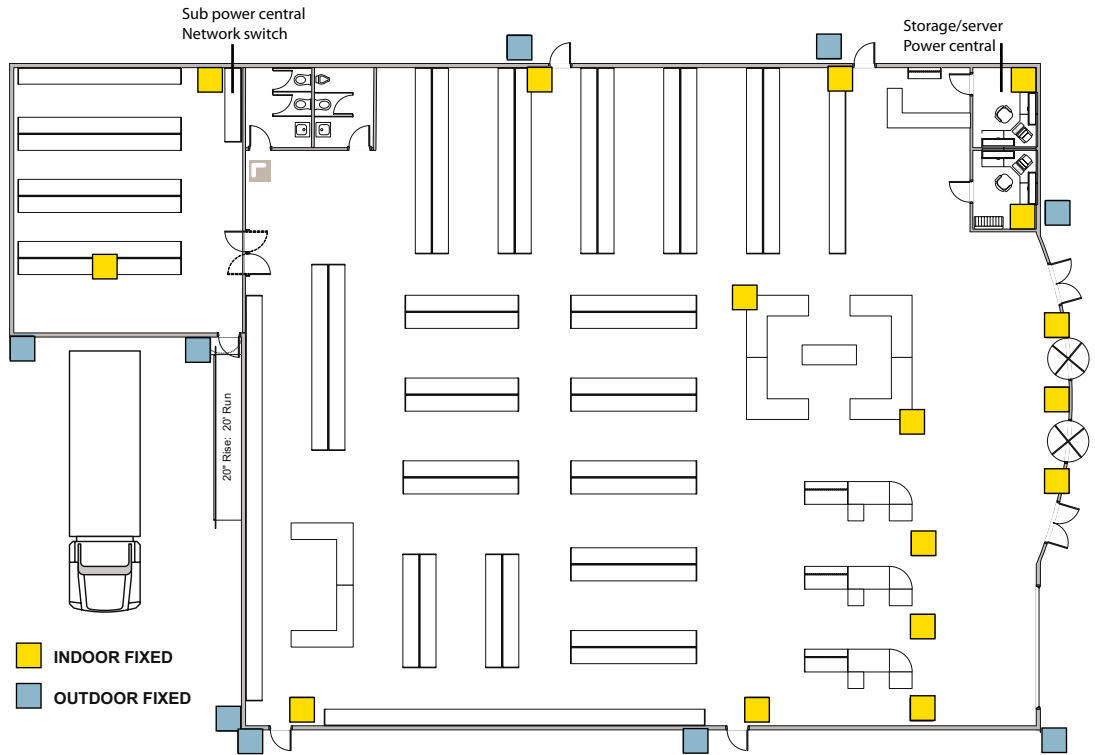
Store layout and camera placement in the scenario with 25 cameras
